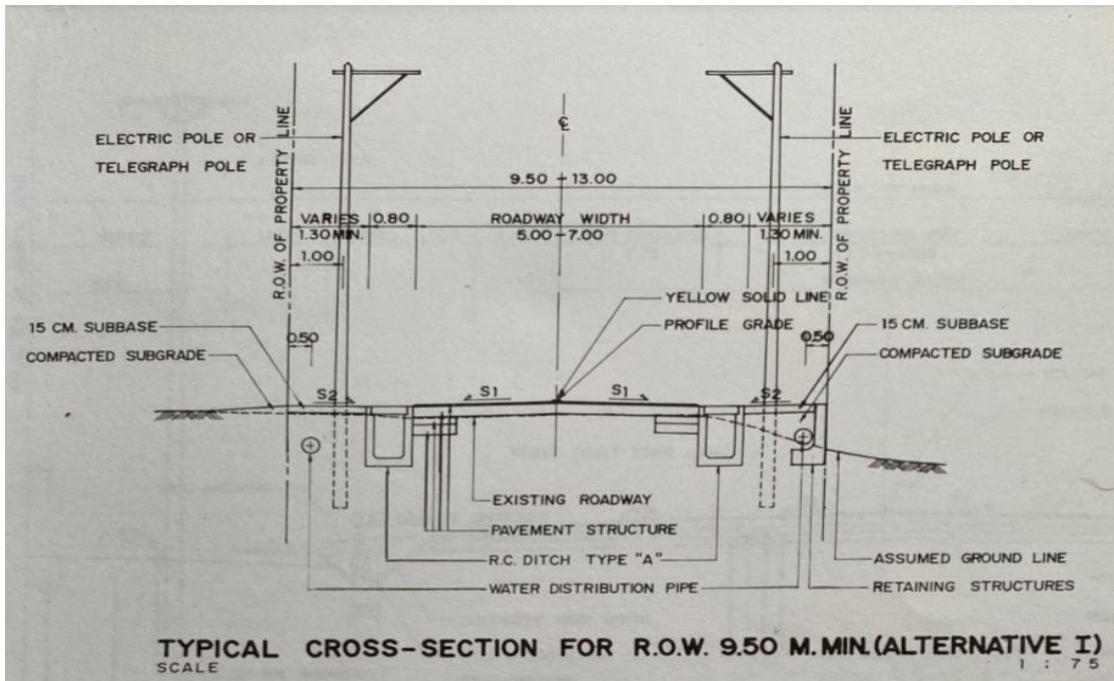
8: Alternative cross section Type 1-(Original source-Standard Drawings Ministry of highways Thailand
